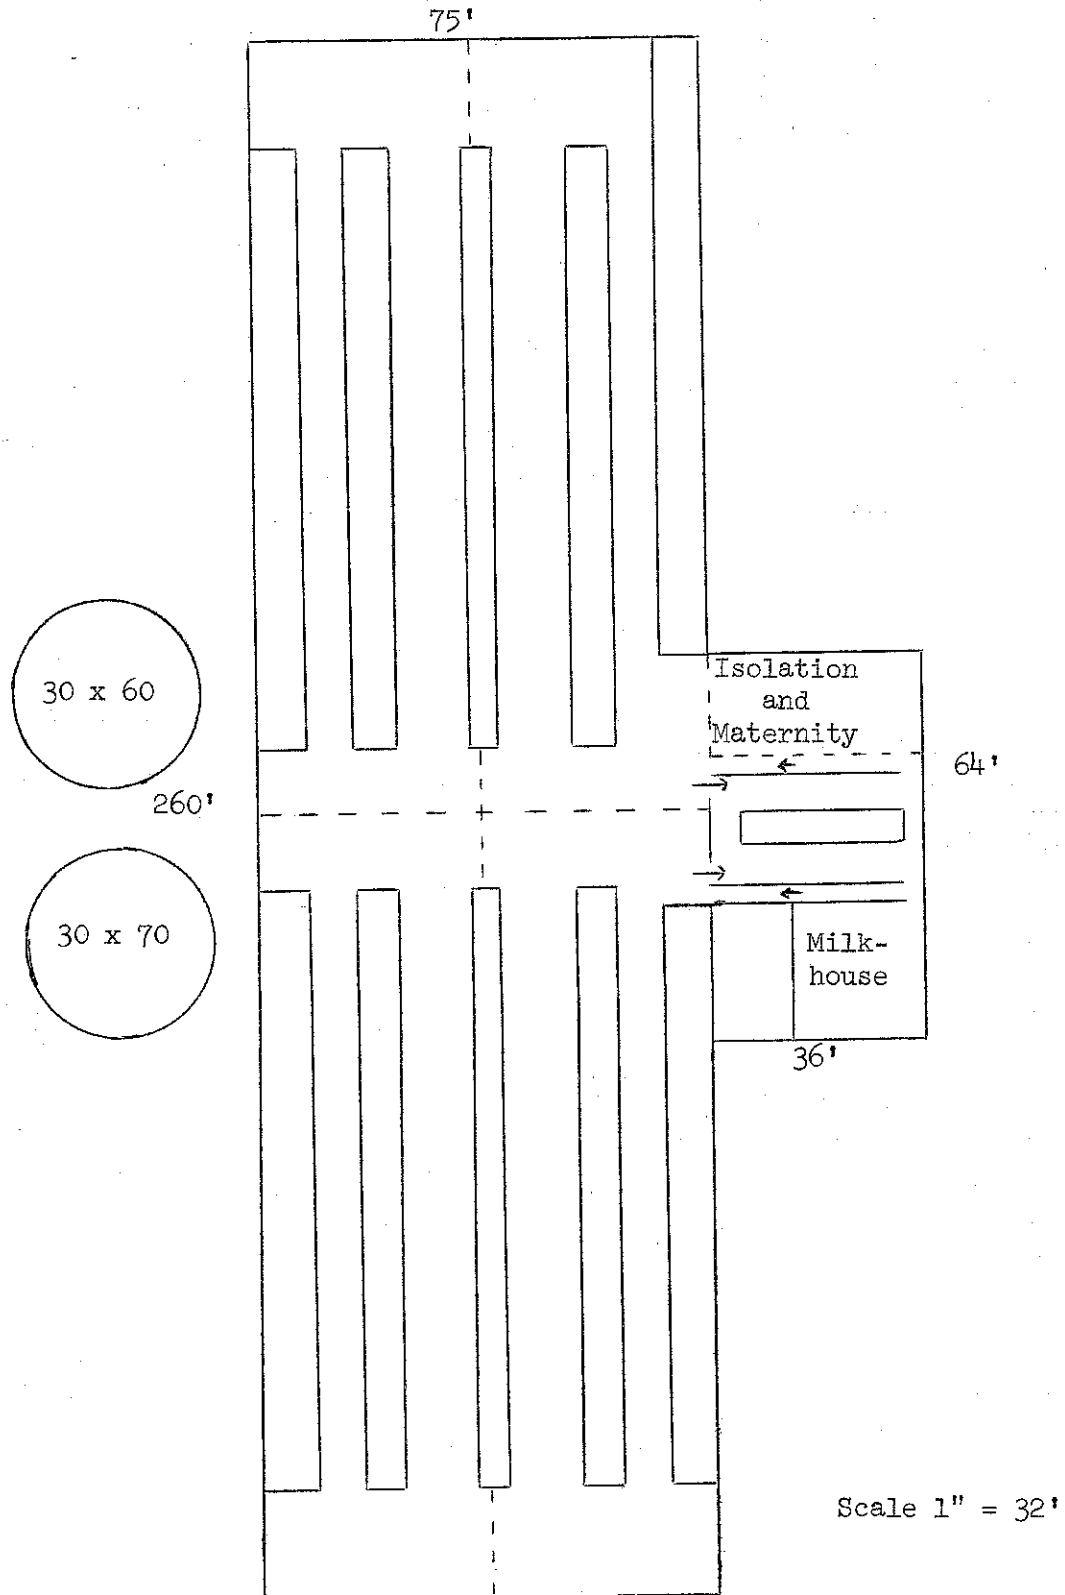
One Possible Floor Plan for a 4-row Free Stall System With 200 Stalls
